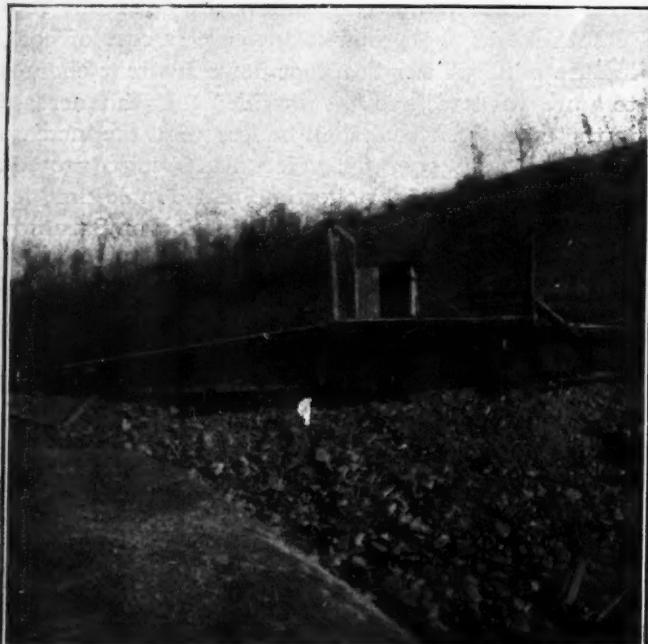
SIDE VIEW OF THE DUMPING DEVICE
